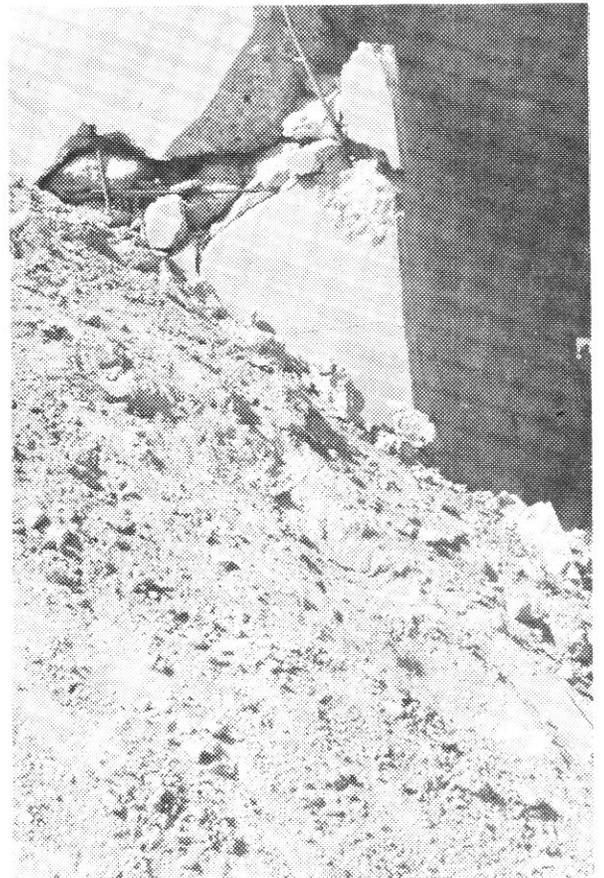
Westerly approach to Balboa Boulevard Overcrossing. Note abutment backfill settlement but lack of differential settlement between wingwall and abutment.
